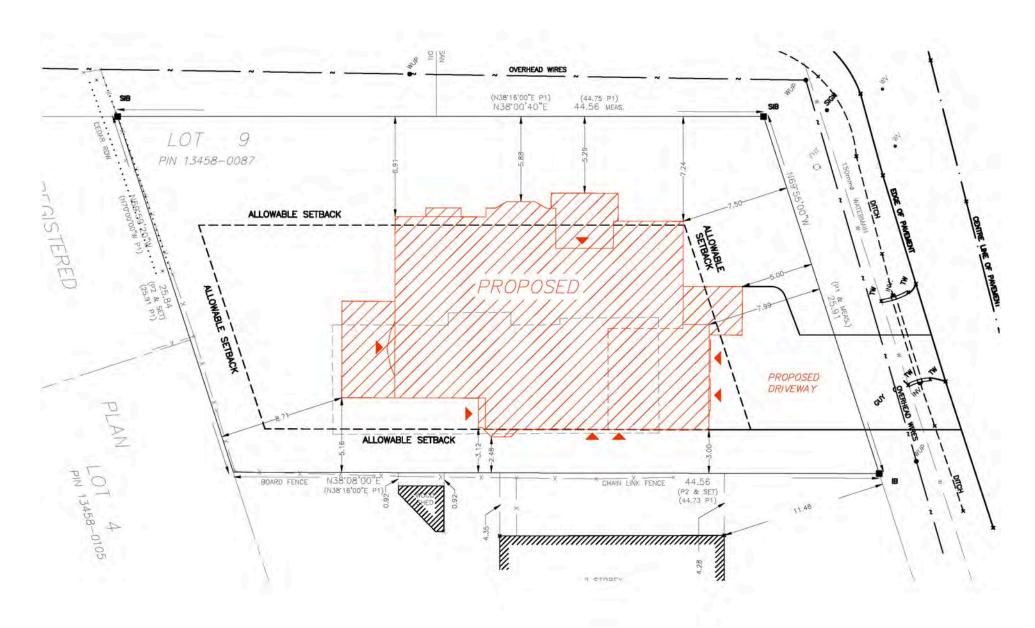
PROPOSED DEVELOPMENT - Site Plan.
